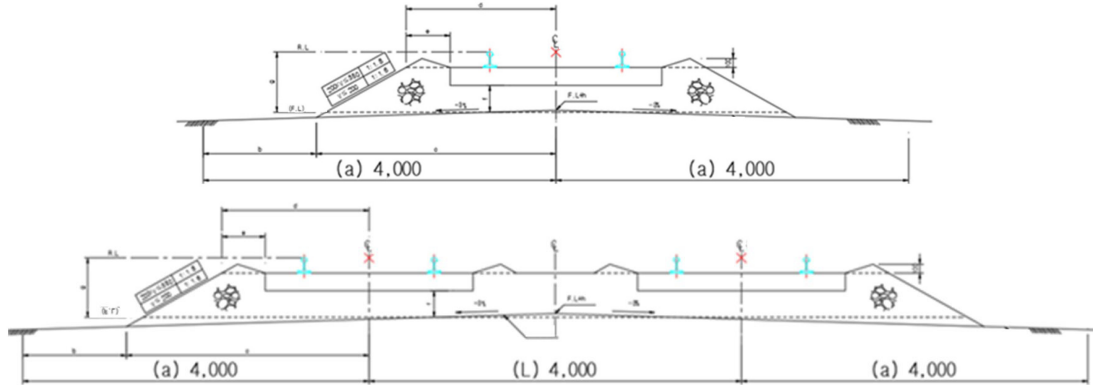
Cross-section of Rail Track (Standard Gauge)
